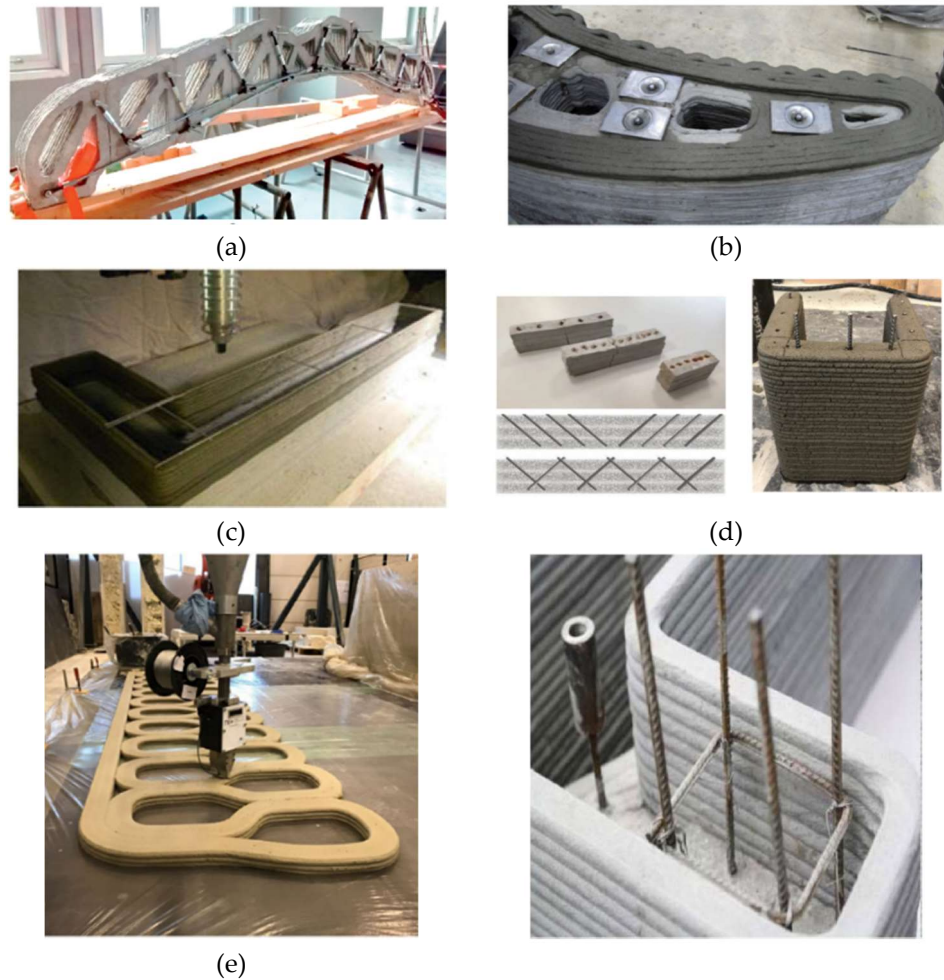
Reinforcement strategies for extrusion based additive manufacturing: (a) and (b) external reinforcement [77], [27] ; (c) reinforcement between the concrete layers [78]; (d) reinforcement using penetration (left [81] right [82]); (e) cable between the layers [85]; (f) reinforcement inside 3D printed concrete formworks [96].
